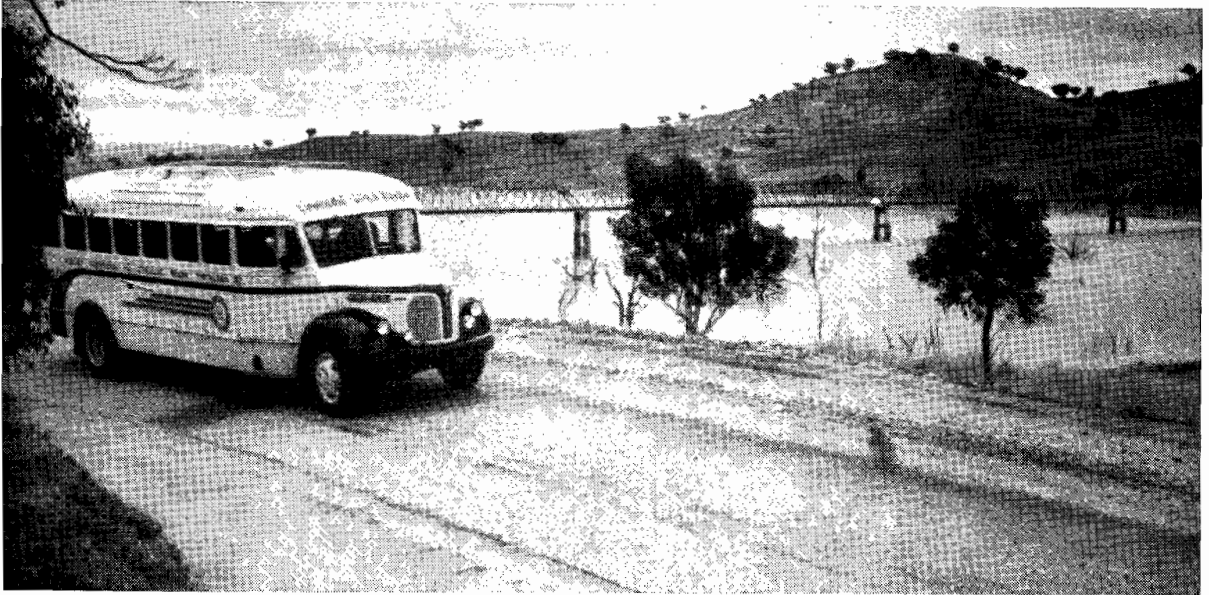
Passenger bus on Murray Valley Road, Towong Shire, section resheeted and sealed.
